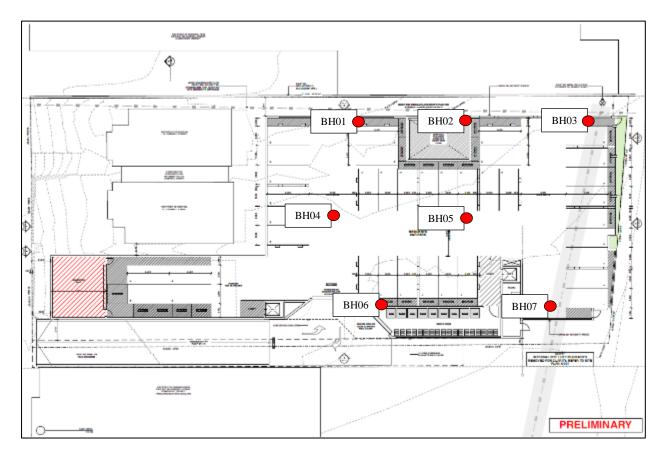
Borehole Plan (Preliminary Architect plans for ground level/basement)
